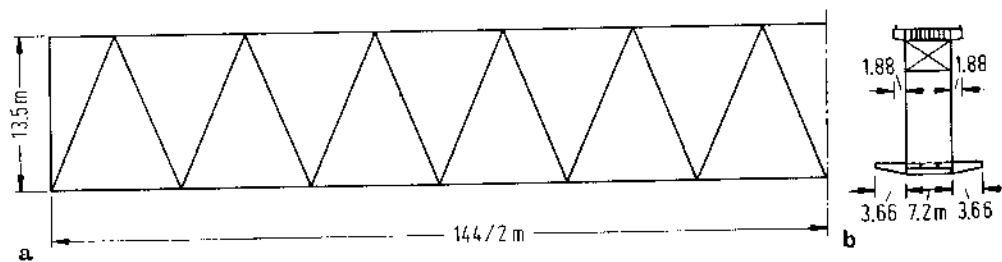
,b. Elevation and cross section of a truss bridge
